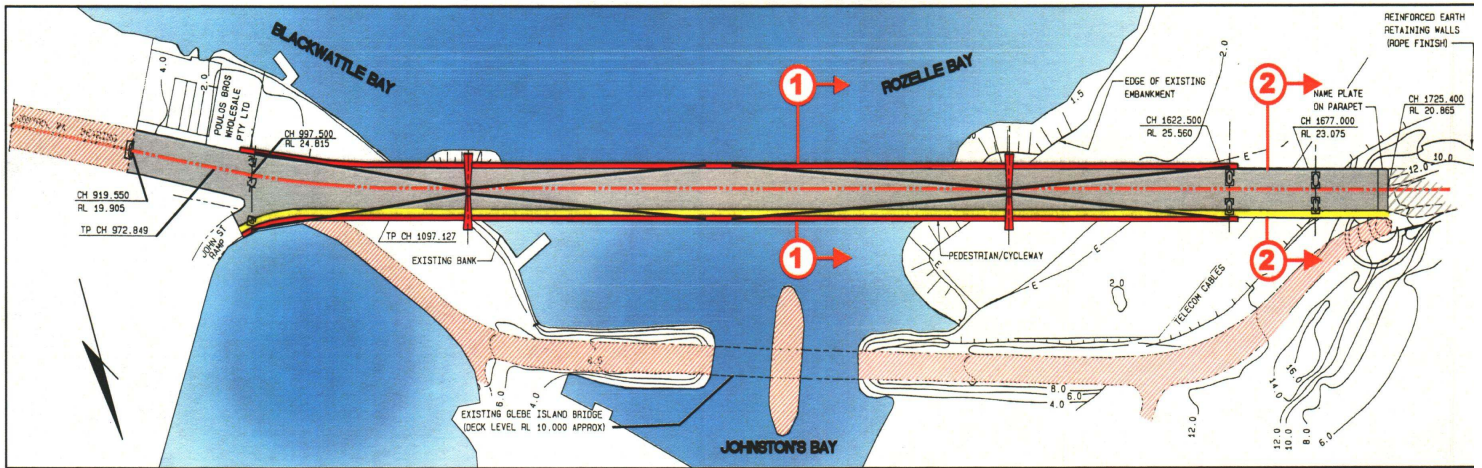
LOCATION PLAN AND SECTION MARKS FOR GLEBE ISLAND, ANZAC BRIDGE WEST OF SYDNEY BUSINESS DISTRICT.
